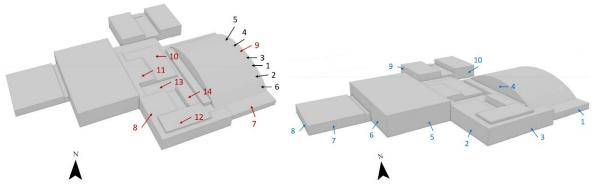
(left): X Delft, building 37, roof FIDs Figure 83 (right): X Delft, building 37, facade FIDs
